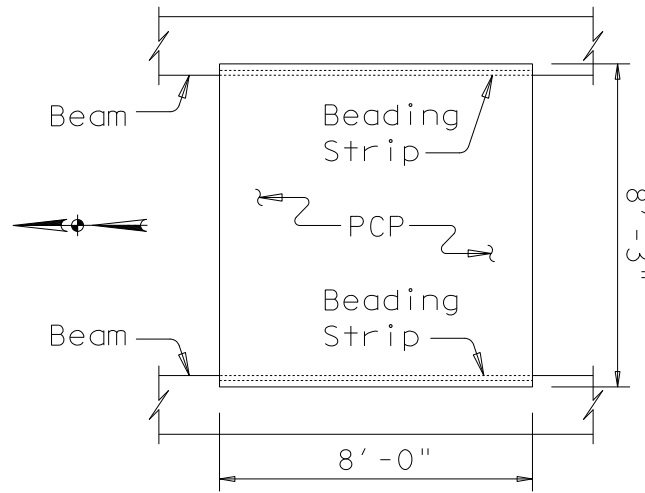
Plan View of Traditional Connection PCP Specimen
